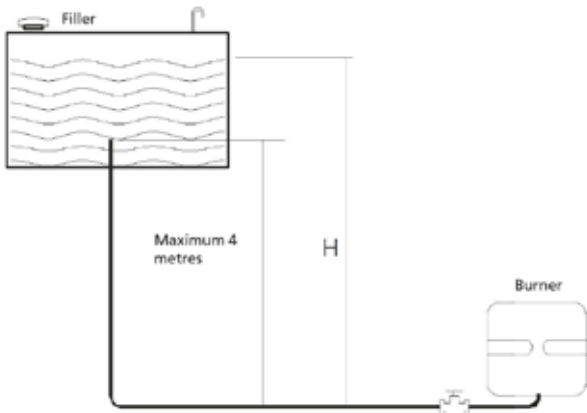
Burner oil pump details 225-300 gravity feed from bottom of tank
